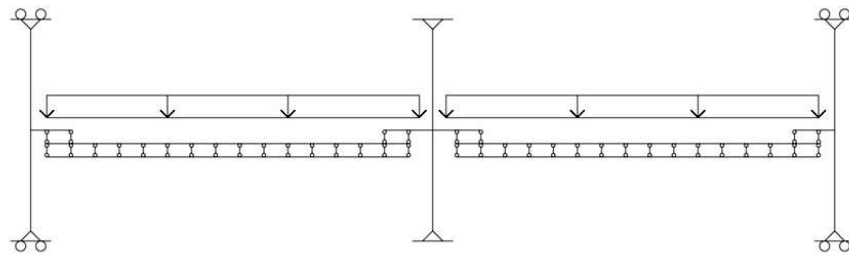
Calculation model for a timber-steel hybrid beams inside a structural frame
